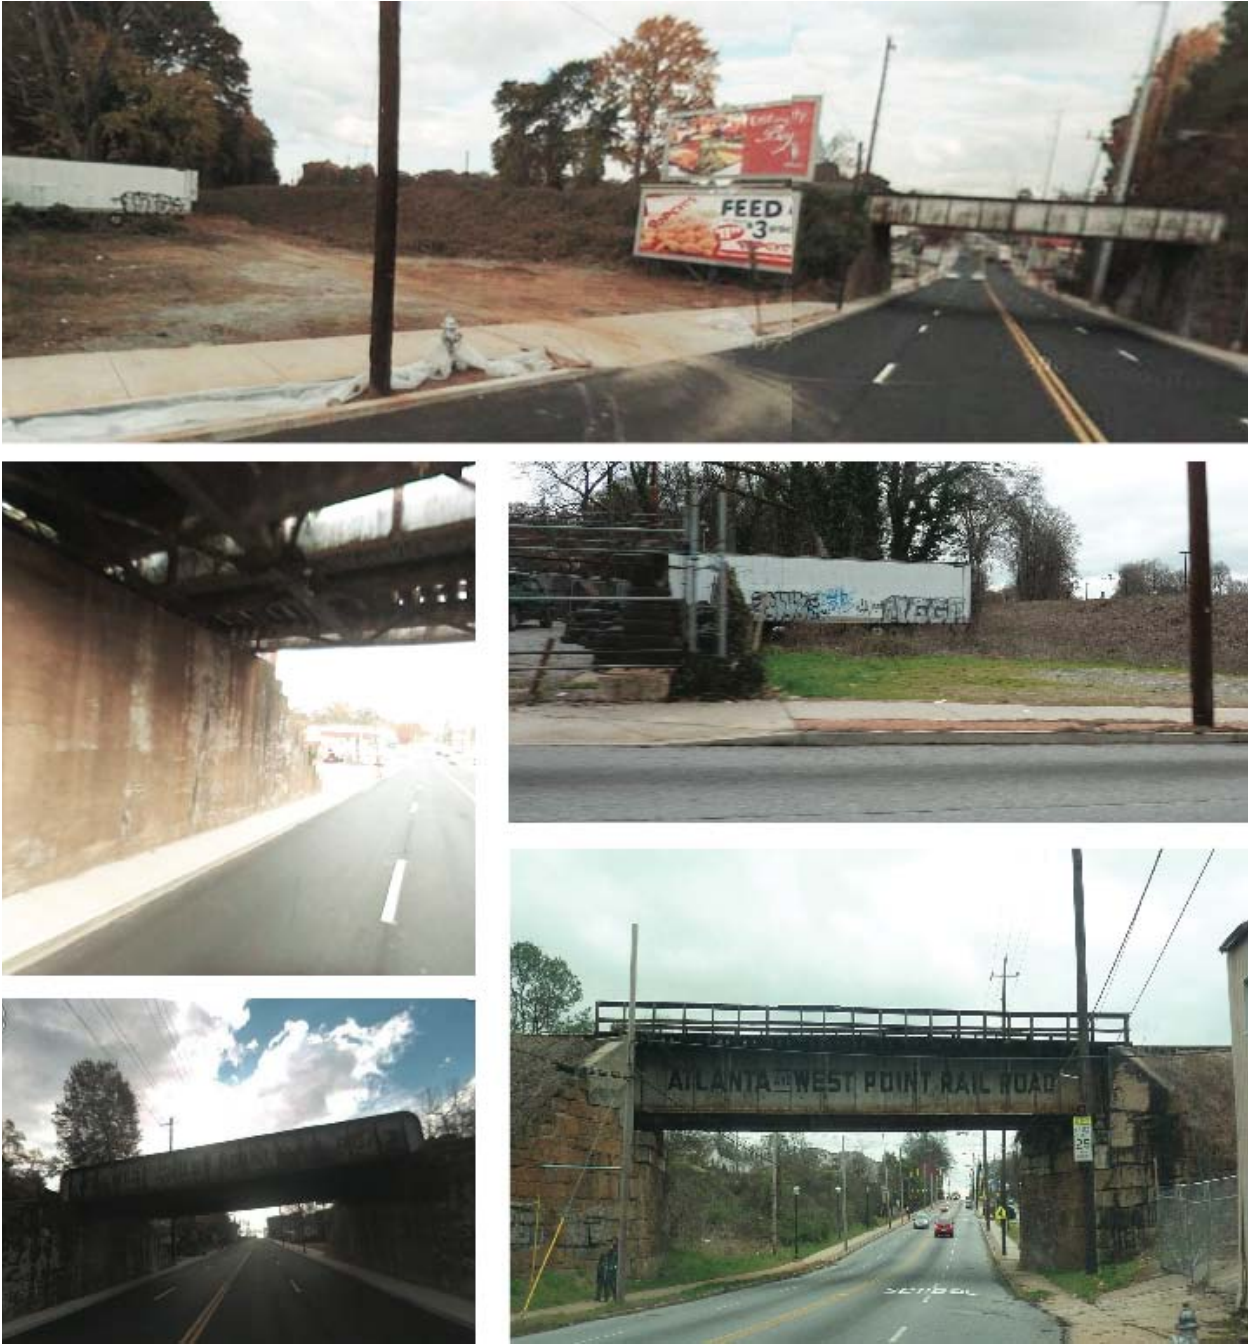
11 Top: existing site looking North, Middle Left: wall under bridge, Middle Right: existing site from street, Bottom Left: bridge looking South, Bottom Right: bridge looking North into Pittsburgh (Landers, 2012)
